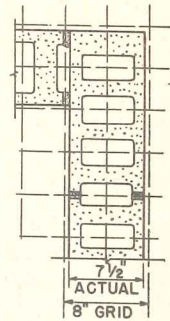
Use of 8-in. grid for layout of concrete block foundation wall reduces cutting of units
